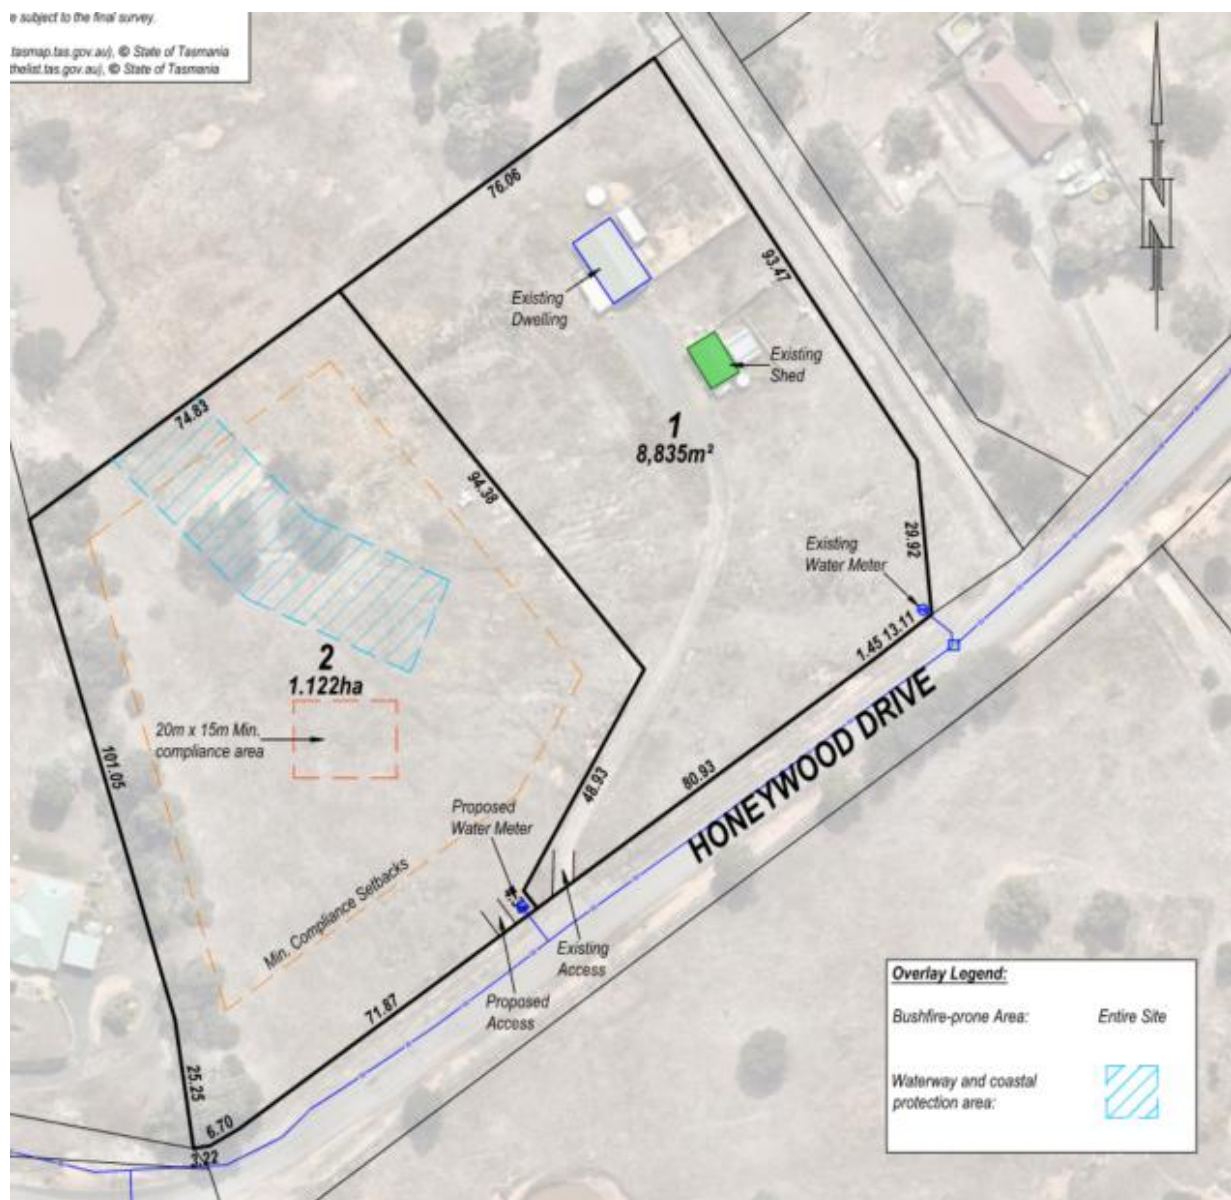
Proposed subdivision at 67 Honeywood Drive, Honeywood. Site plan credit: Rogerson & Birch.
